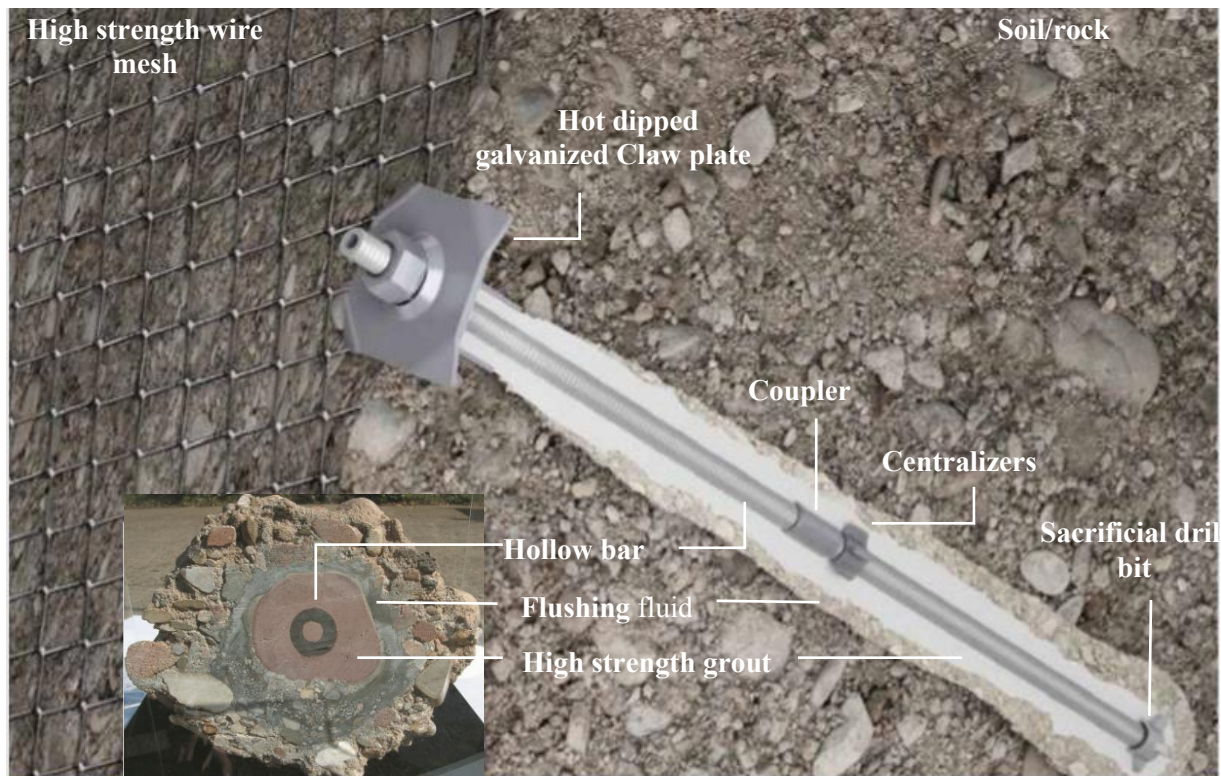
cross-section through a soil nail (Ischebeck TITAN) where the zoomed image (bottom left) shows the cross-section of the grouted body (Friedrich Ischebeck GmbH 2019).
